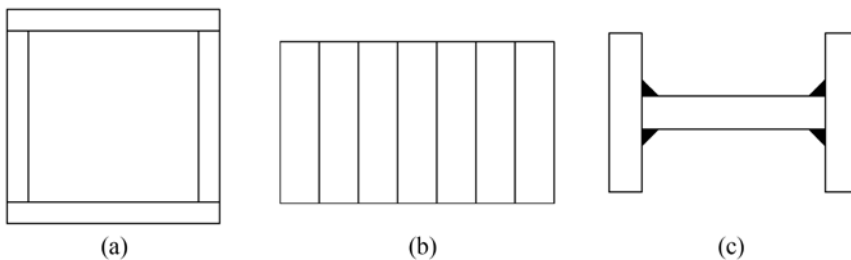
(a) shows a wood box beam constructed of two planks, which serve as flanges, and two plywood webs. The pieces are joined together with nails, screws or glue in such a manner that the entire beam acts as a single unit. Box beams are also constructed of other materials, including steel, plastics and composites.
